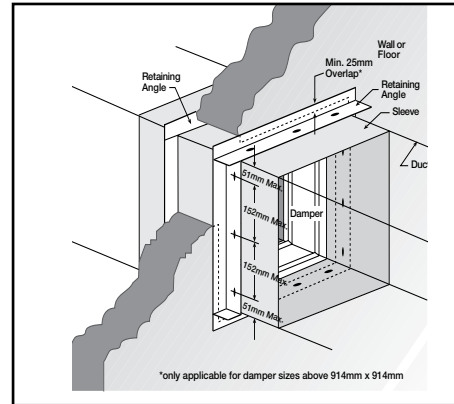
Both vertical and horizontal damper installations are typified by these drawings.
